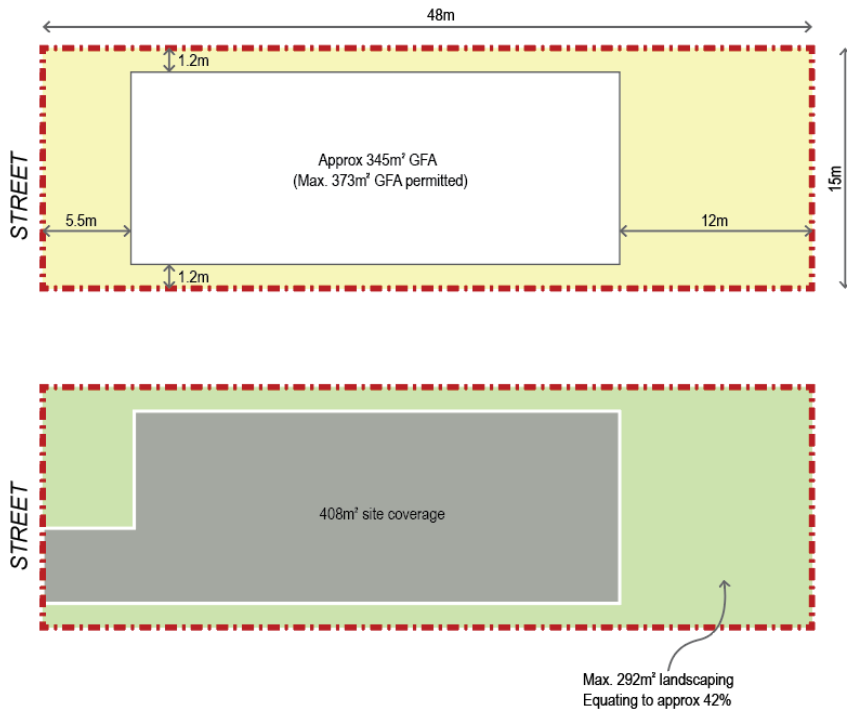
Plan of single storey dwelling house on a 700sqm site (FSPA)
